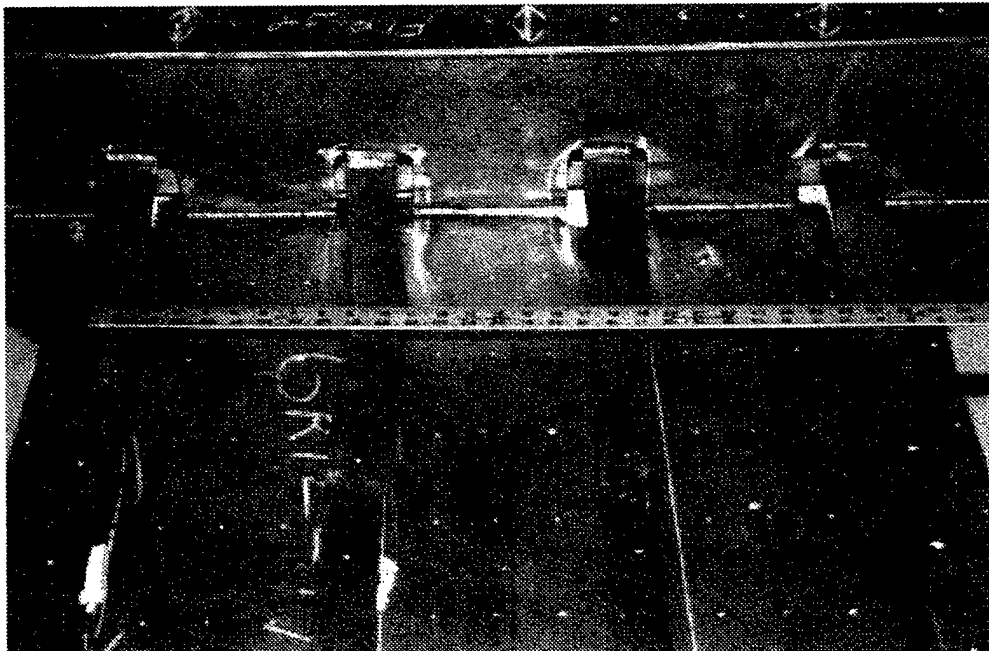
Grillage 0894 - Detail of Stiffener Collapse
